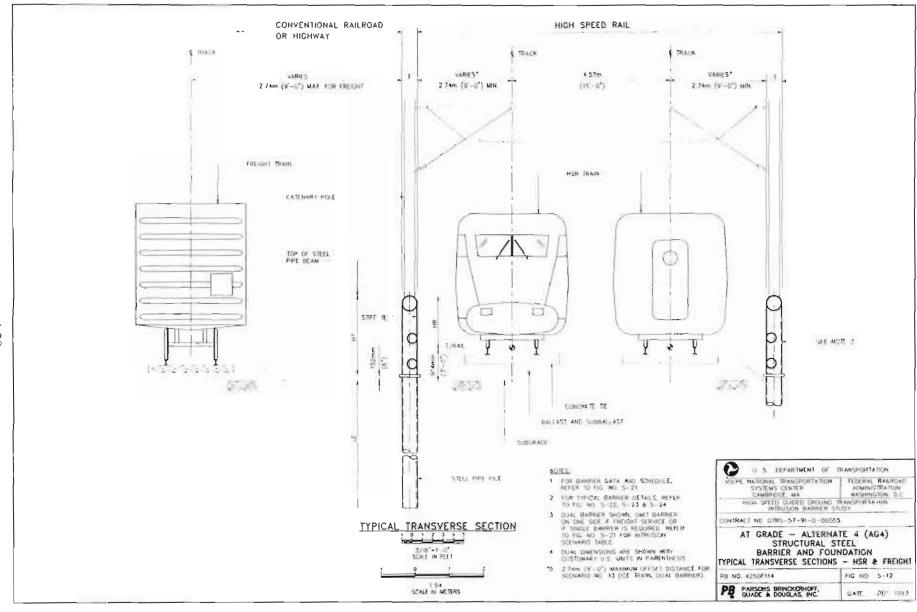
AT GRADE ALTERNATE 4: STRUCTURAL STEEL POST, RAILING AND FOUNDATION - TRANSVERSE SECTION/RR
